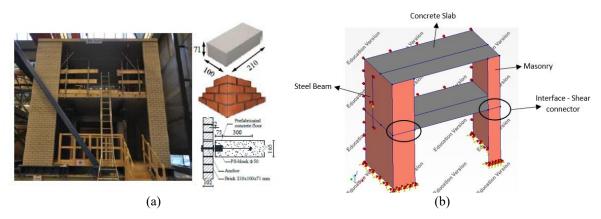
(a) Specimen and construction detail of a typical two-storey terraced house [4] and (b) Simplified modelling schematic.
